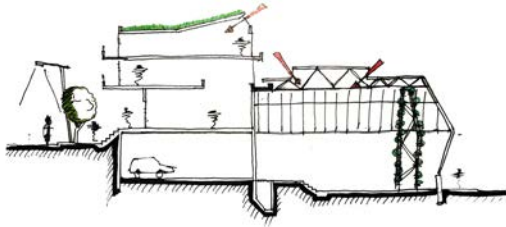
Greenhouse section sketch 1 (Author 2018)
